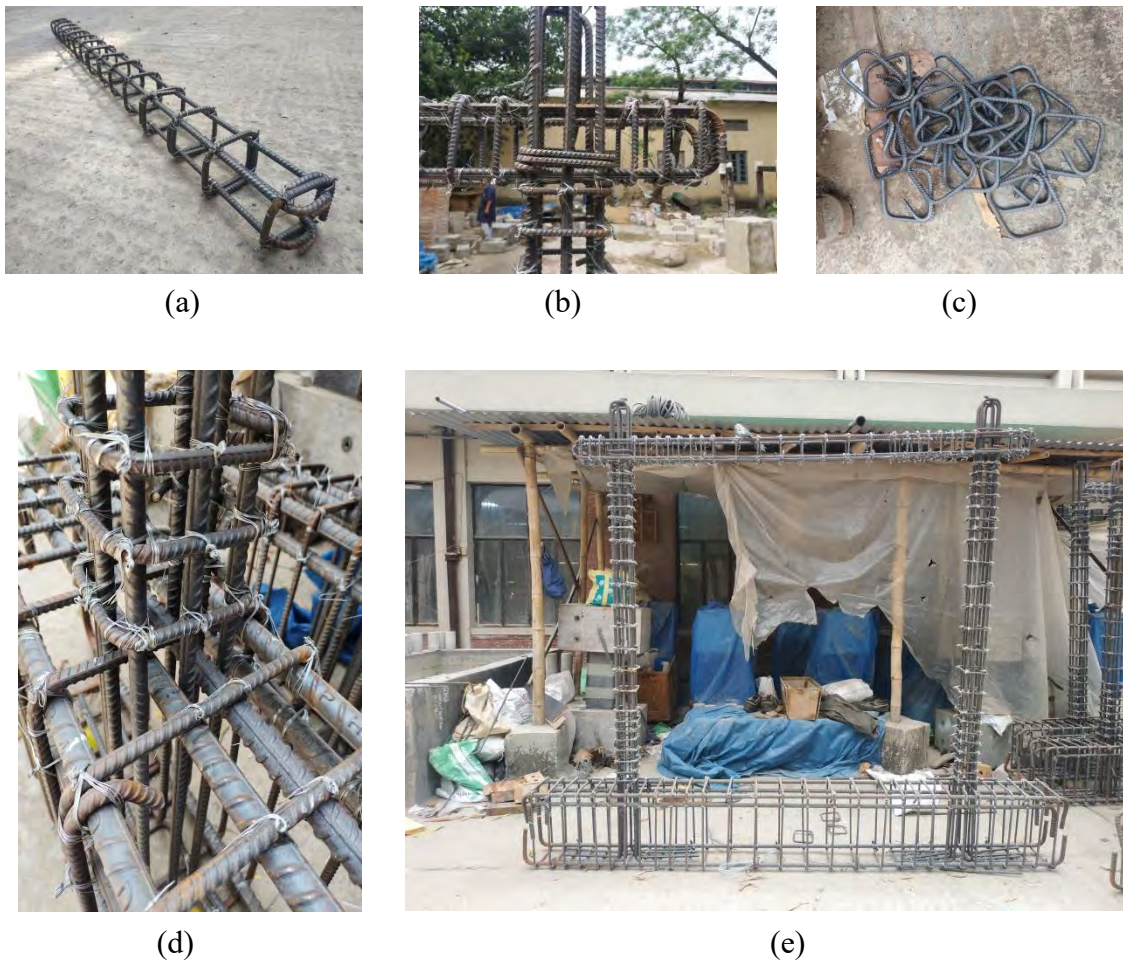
(a) lintel, (b) beam-column joint, (c) stirrups / ties, (d) column-base joint, (e) a full reinforced structure.
